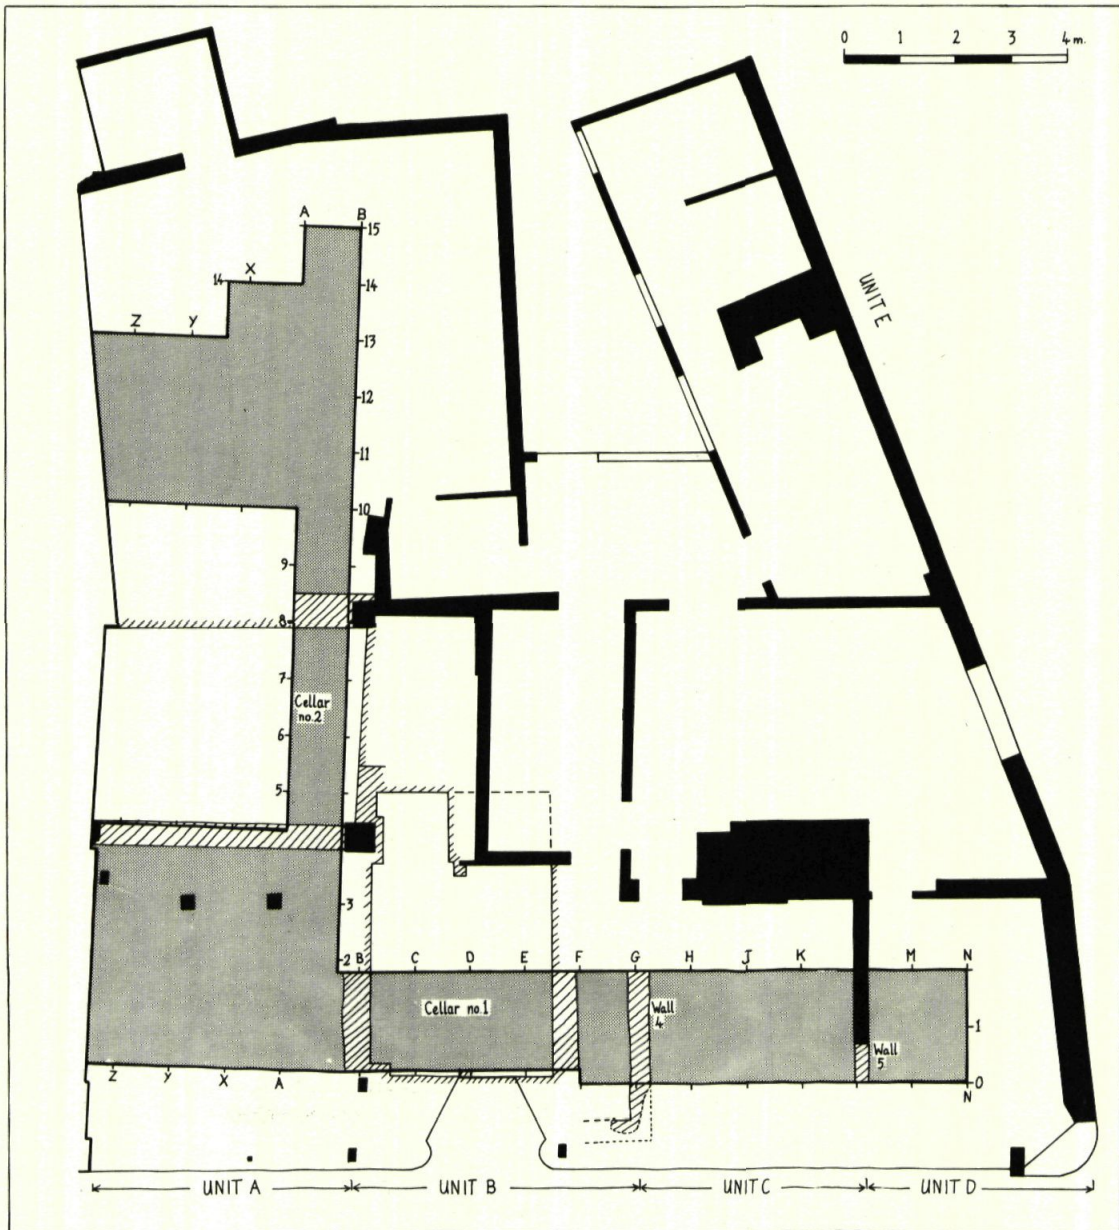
Johnson's Corner: plan of nos 50–52 High Street and no 2 Market Street showing the unit numbers used in the description of the buildings, and the areas excavated. See Fig 3 for orientation.
